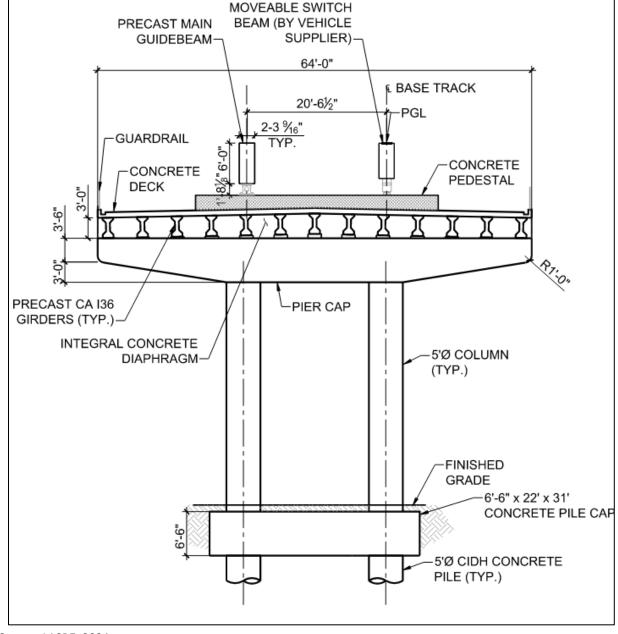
Typical Monorail Beam Switch Cross-Section
